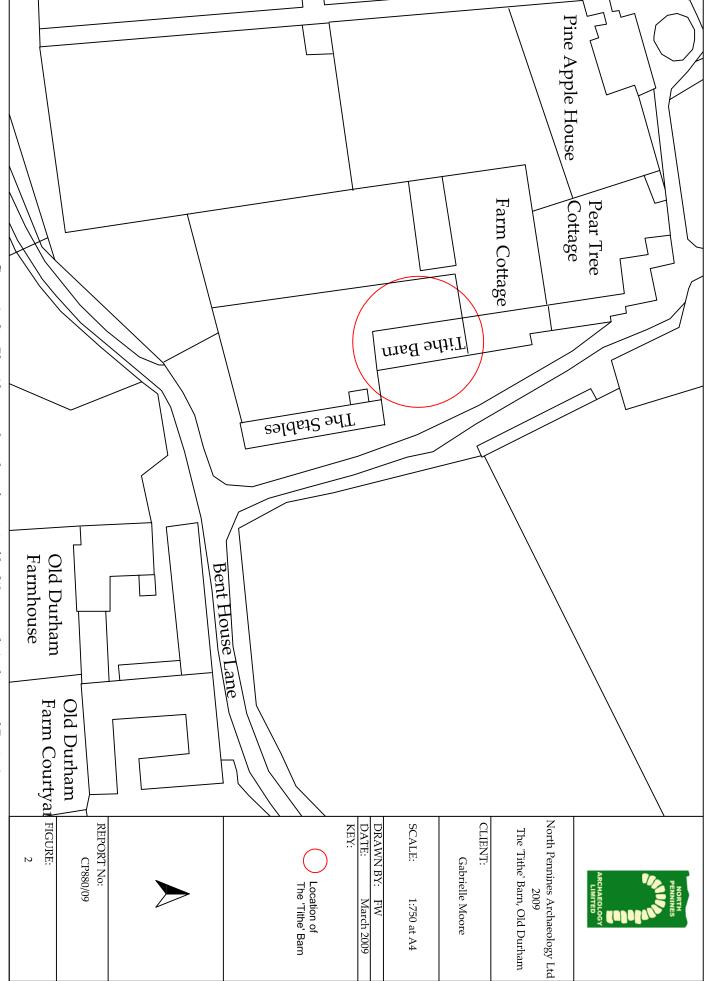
Site Plan (drawing based on the original by Wearmouth Architectural Design)
